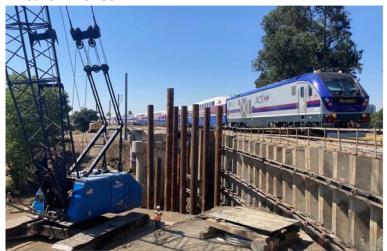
Cast-in-Concrete-Shell (CISS) piles being installed for MT2 pier 5 while MT1 remains in service
